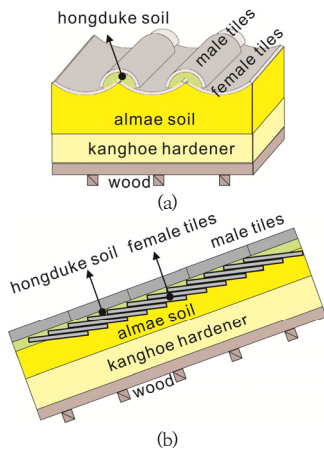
Traditional Korean-style clay roof construction-wet method (a) side view (b) cross-sectional view
